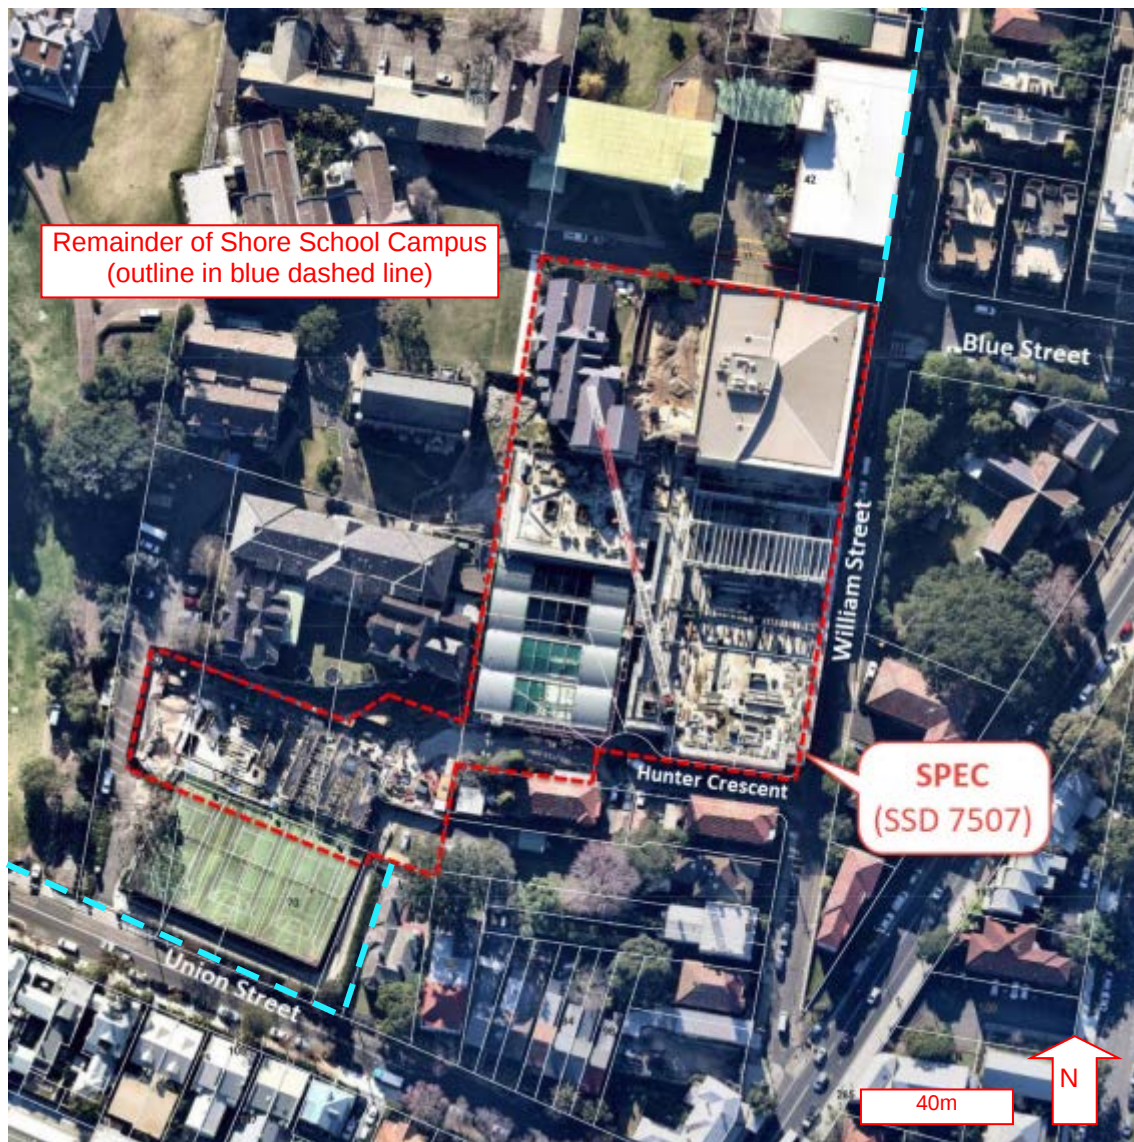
| Site Location (Source: Applicant's Modification Application 2019)
